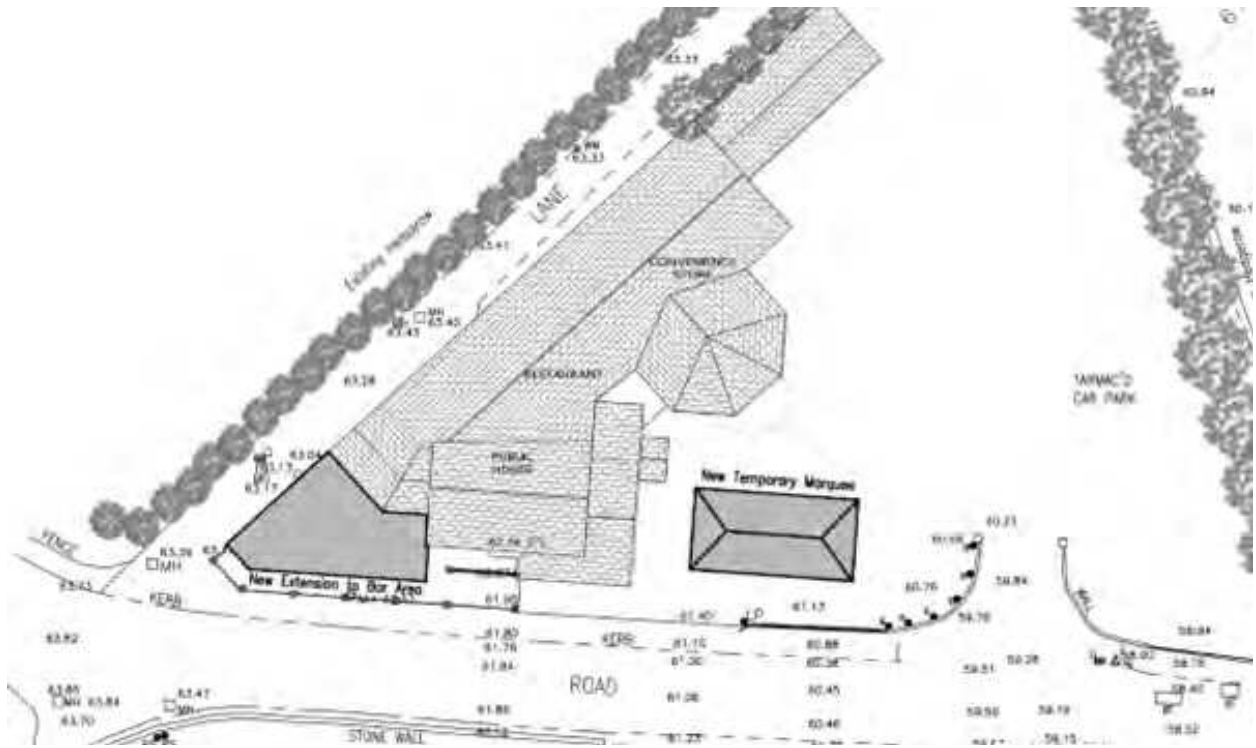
Current scheme (amended): proposed extension to bar and restaurant including extension of off sales area within existing shop and temporary marquee
